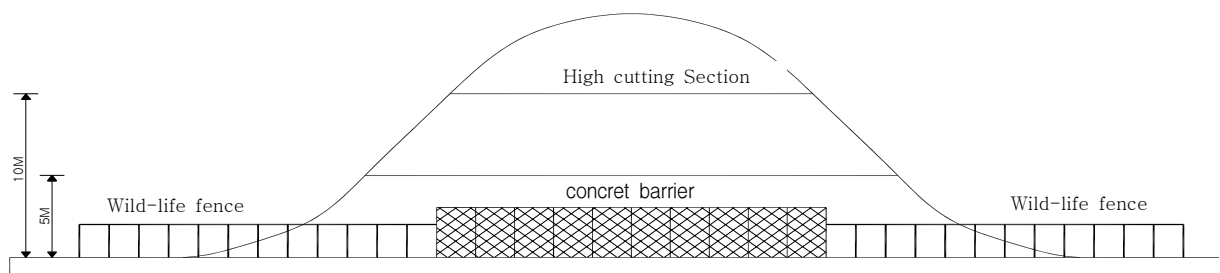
Wild-life fence Installation improvement plan of high cutting section
